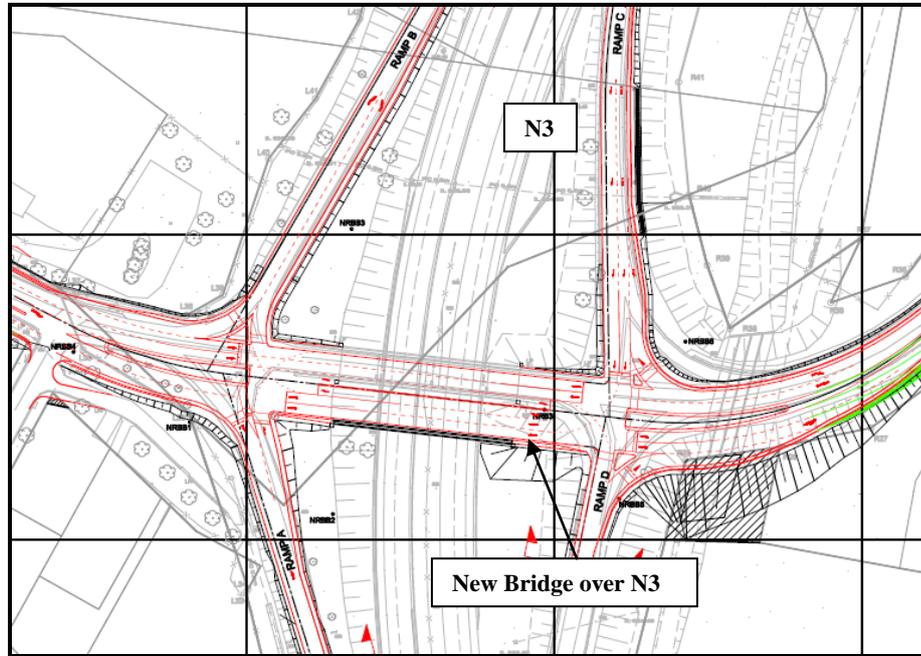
Plan View of the New England Road Site (SANRAL Contract N003-003-2005/1, 2007)
